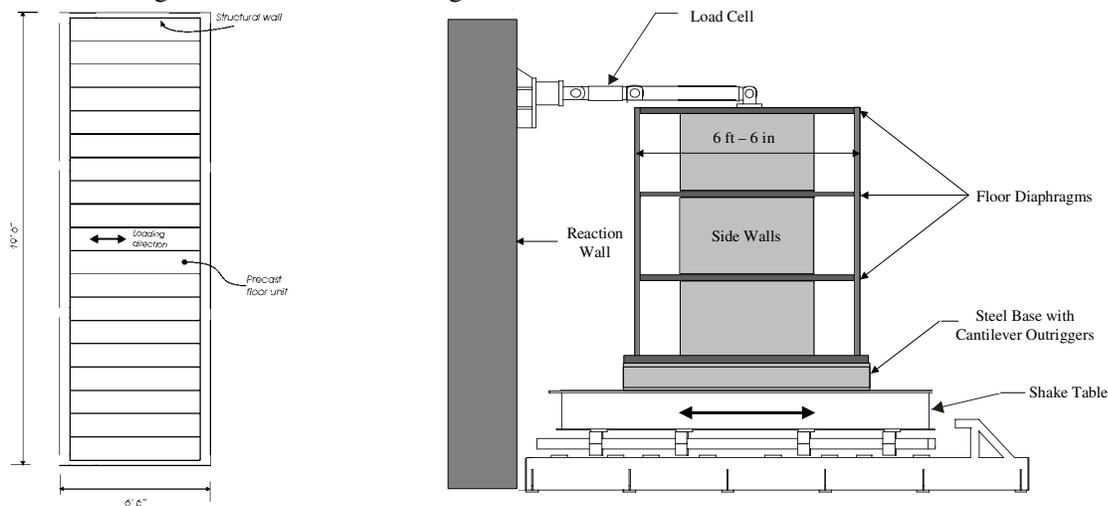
a. Diaphragm Plan View for UCSD System Test; b. Quasi-static Testing of 3rd Floor Diaphragm
